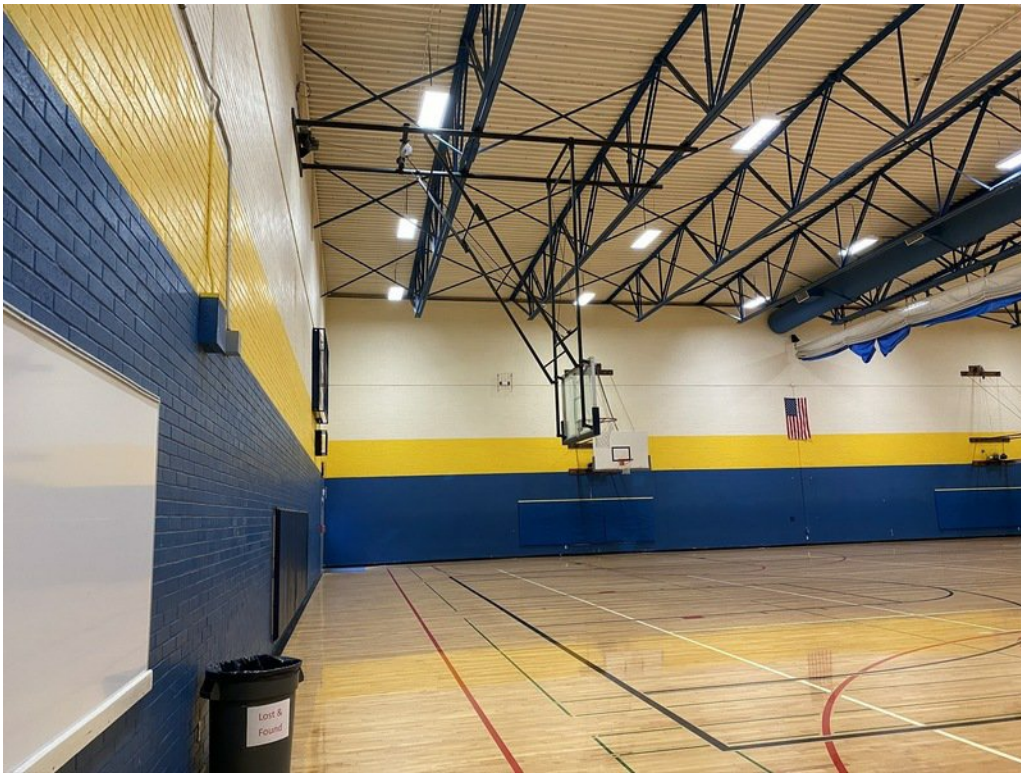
Gym Interior Looking Parallel to Open Web Steel Roof Joists.
